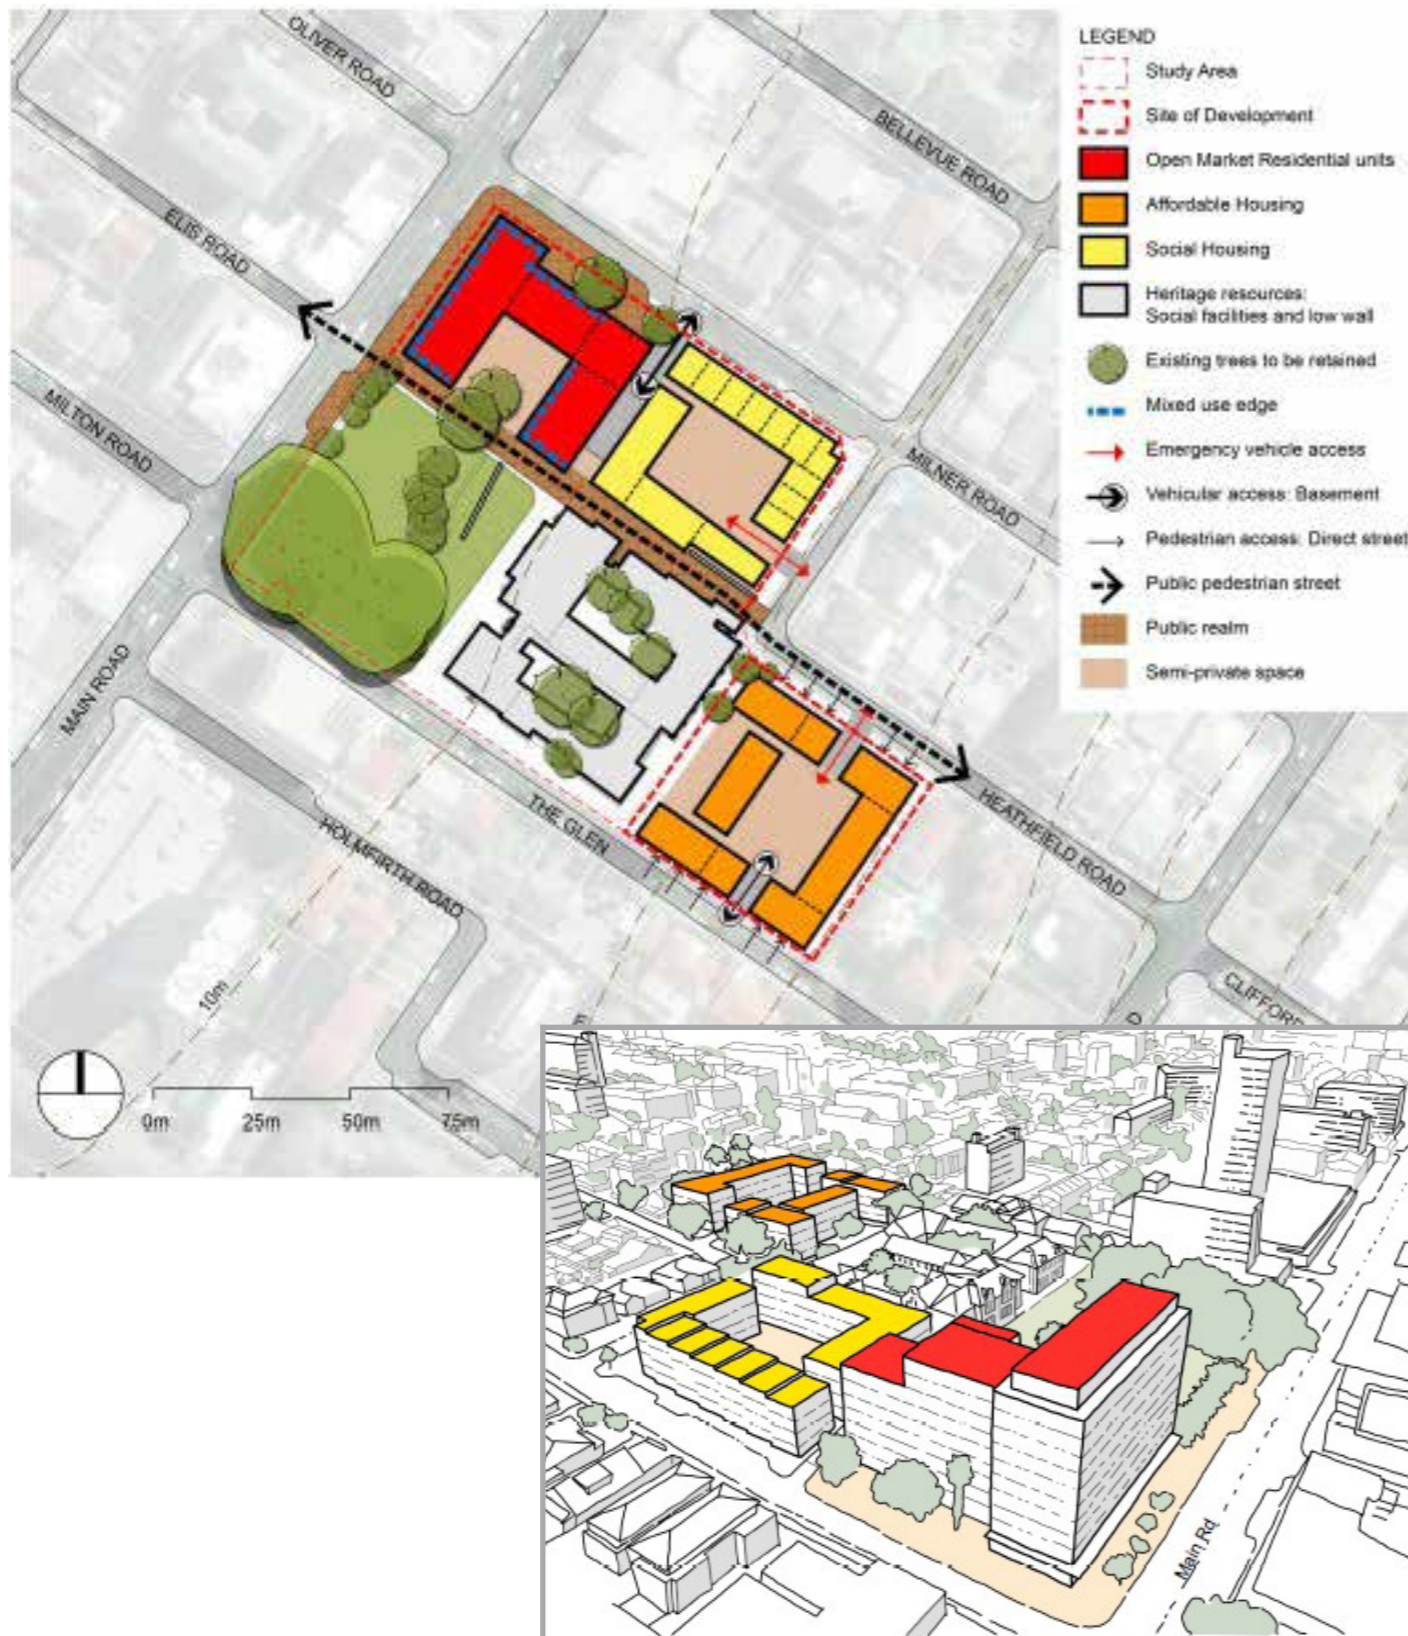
Concept Design 3A: Site Plan and Massing (inset) (Zutari, 2025)
